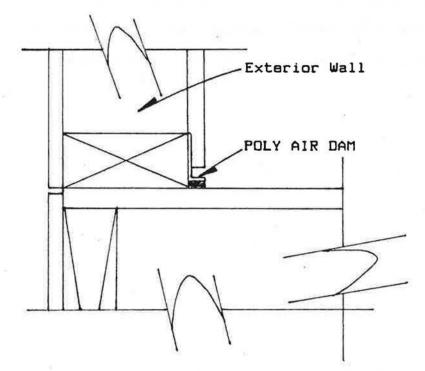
POLY AIR DAM installed at sill plate on wooden subfloor (staple to either subfloor or framing).
